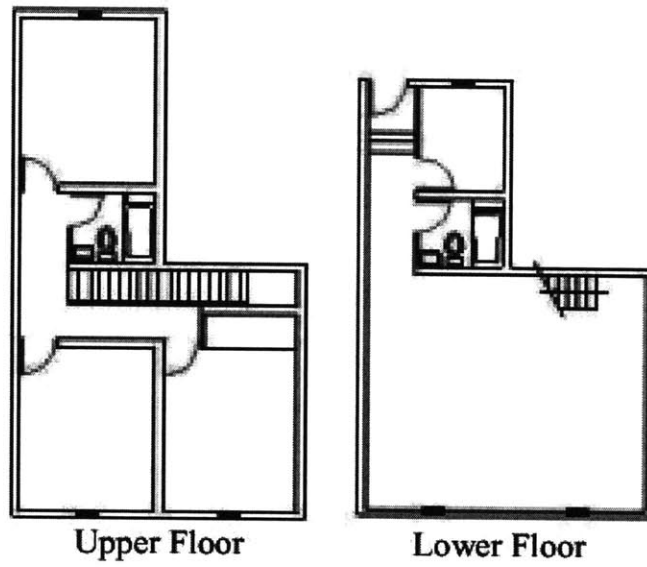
The layout of the duplex apartment in Shanghai building complex.
